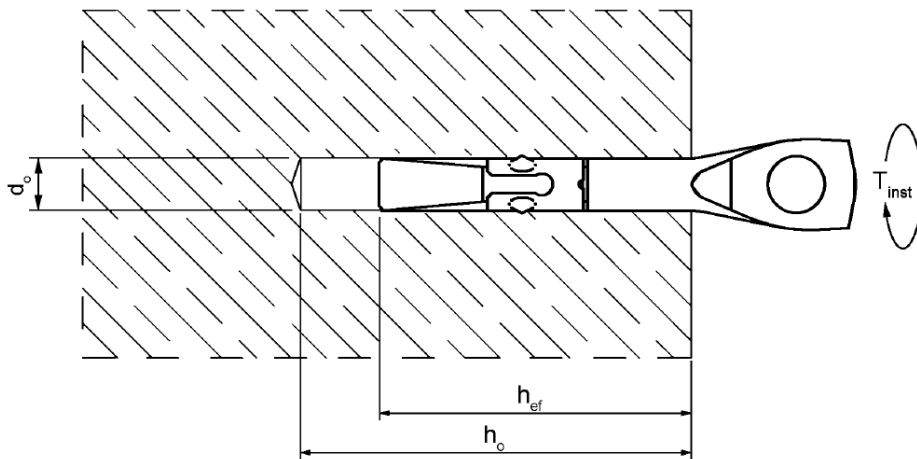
Installation parameters of TT-THROUGH BOLT steel expansion fasteners, version TWH
